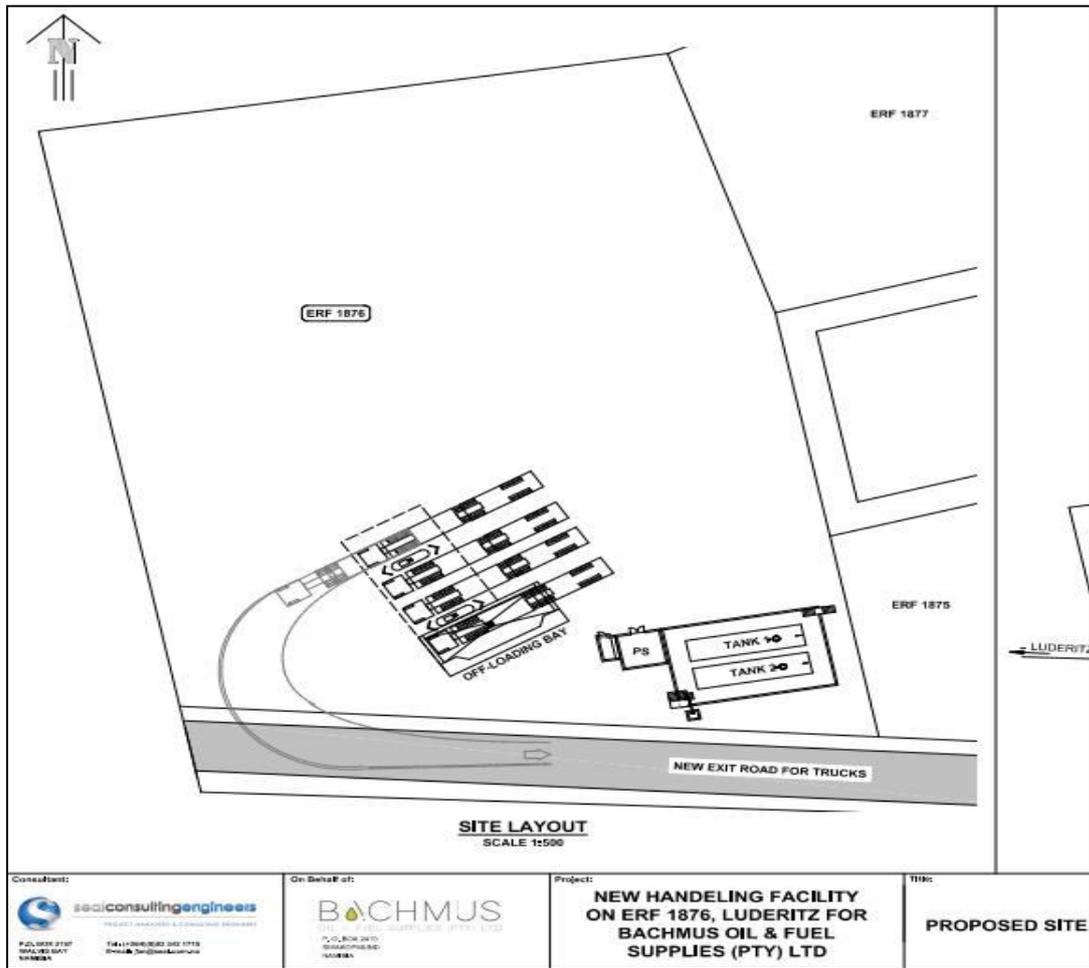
Proposed site plan showing the facilities on Erf 1876, Lüderitz
